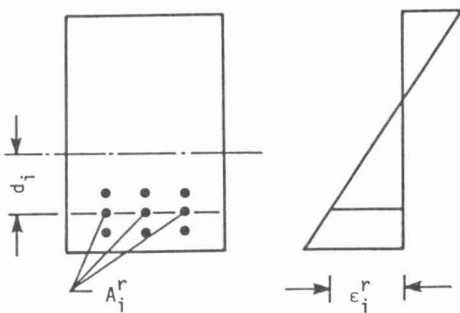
Cross Section of Reinforced Concrete Beams.
